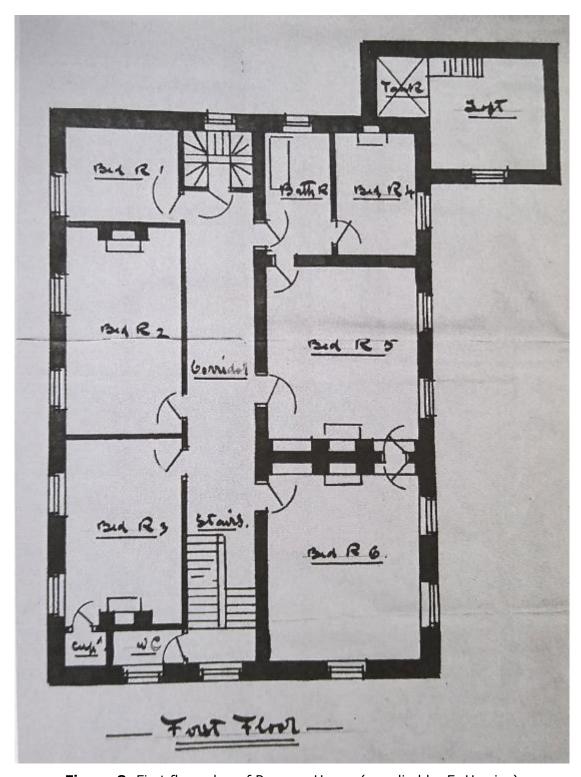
First floor plan of Rumsey House (supplied by E. Harries)
